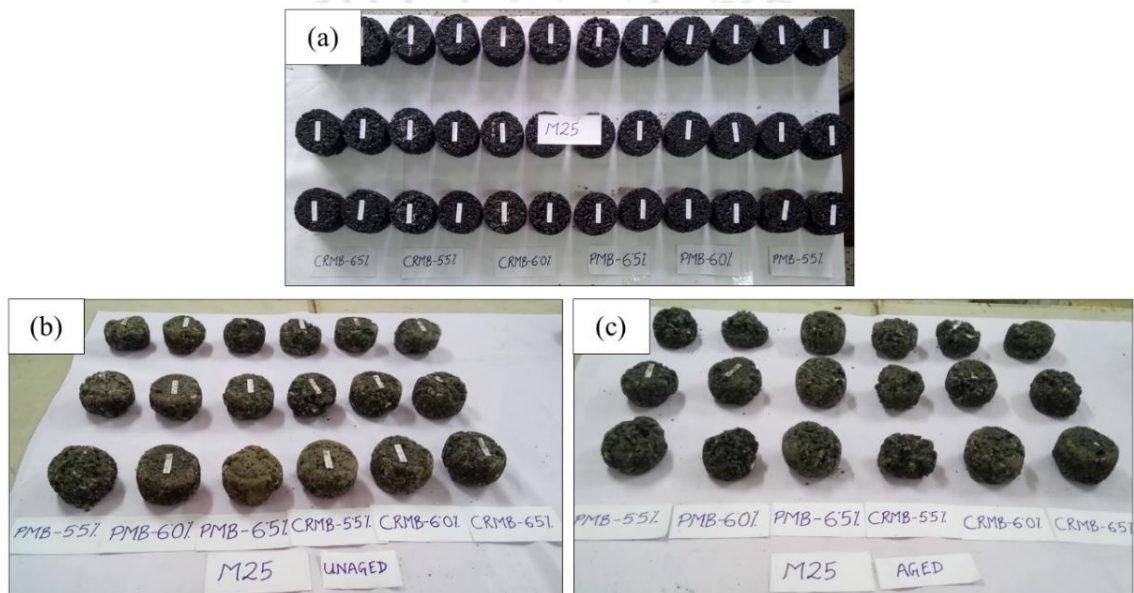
Cantabro abrasion loss test specimens: (a) OGAFc samples prepared with 25% BOF steel slag, (b) unaged OGAFc samples after Cantabro abrasion loss test, and (c) aged OGAFc samples after Cantabro abrasion loss test.
